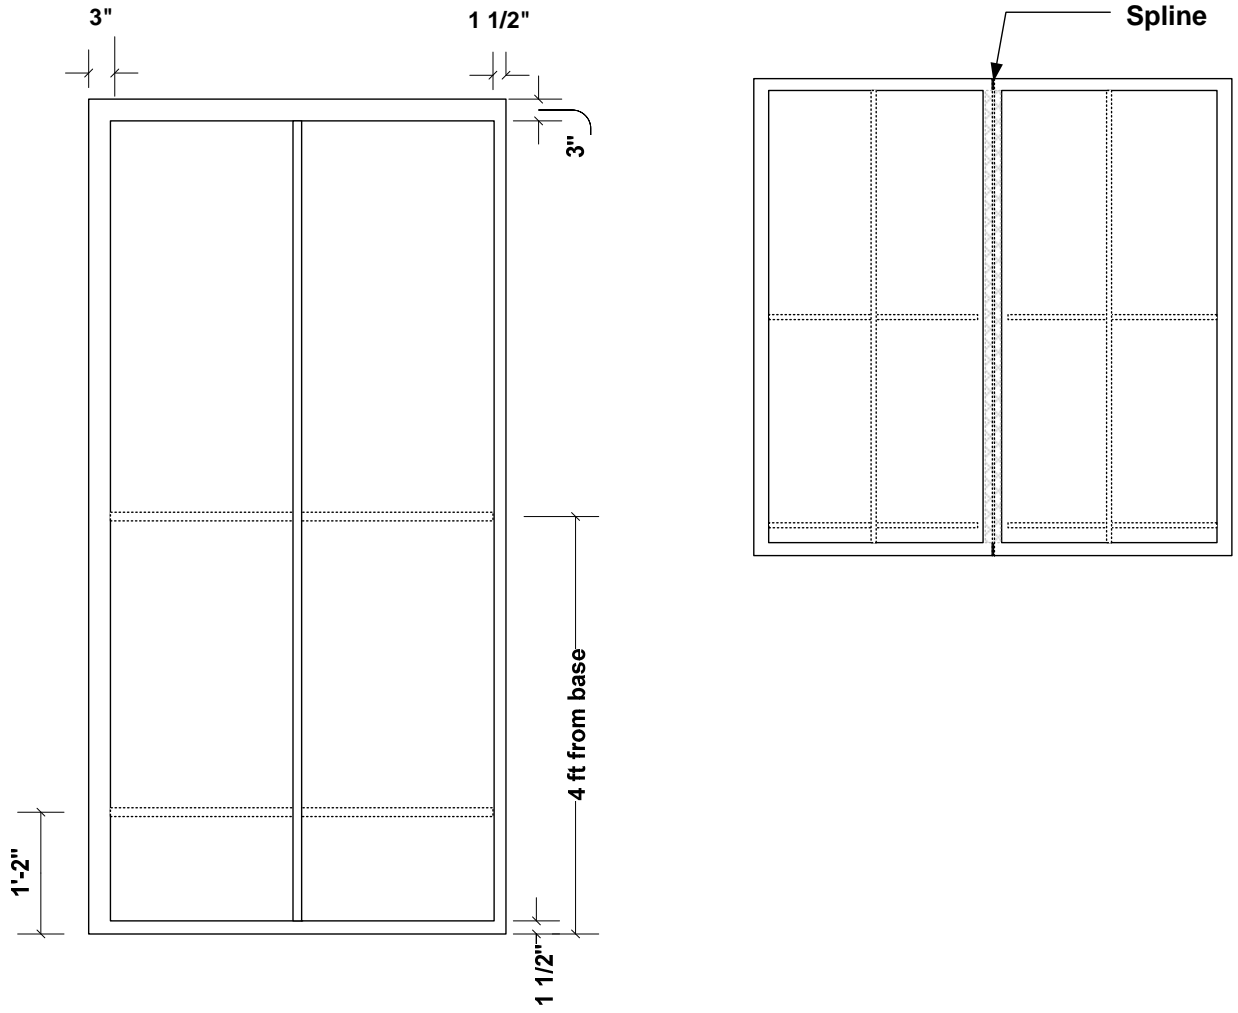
RACKING SHEAR TEST SPECIMEN AND ASSEMBLY
